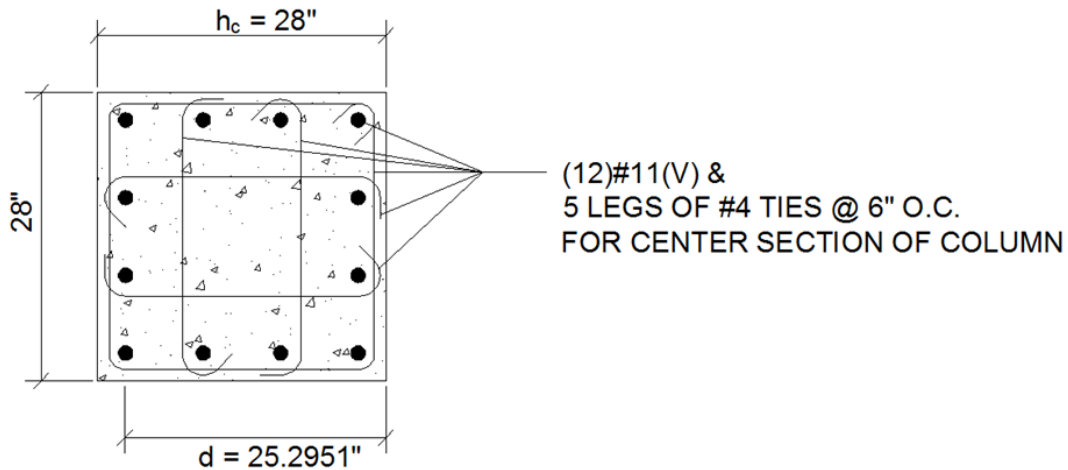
Exterior column, cross-section at center section of column at ground floor level based on tsunami design requirements.
